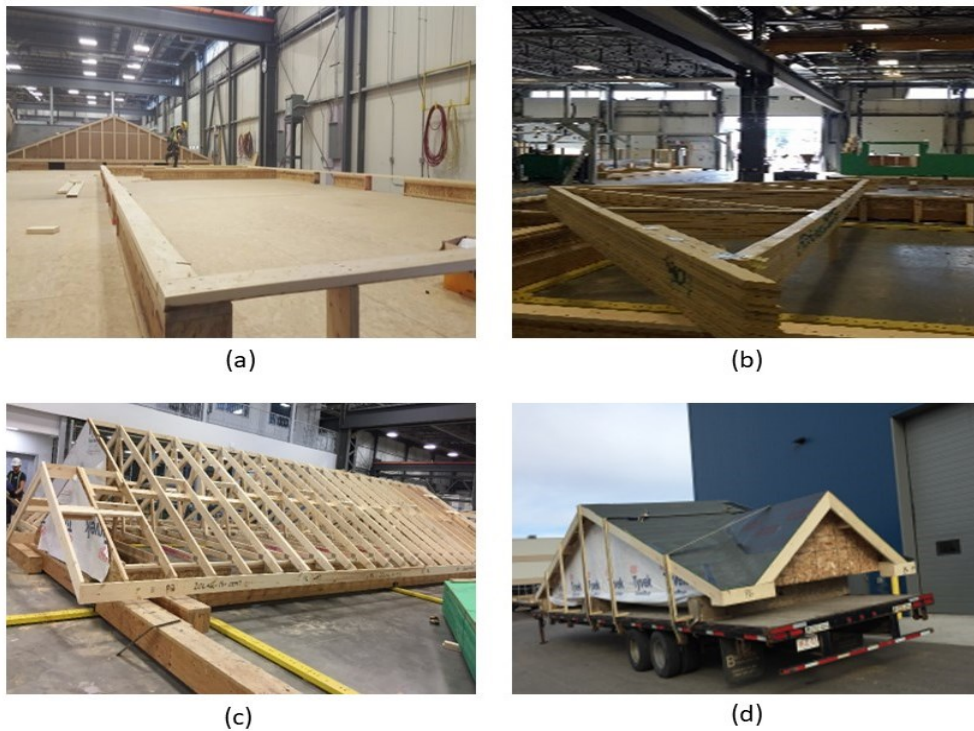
Roof production (a) setup jig, (b) unloaded truss, (c) attaching roof components, and (d) small roof module on the transportation trailer (ACQBUILT Inc. 2019).
